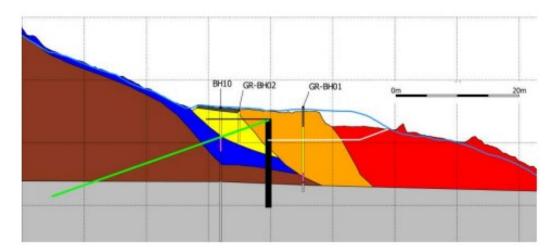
Sub-option 1: Anchored soldier pile wall
